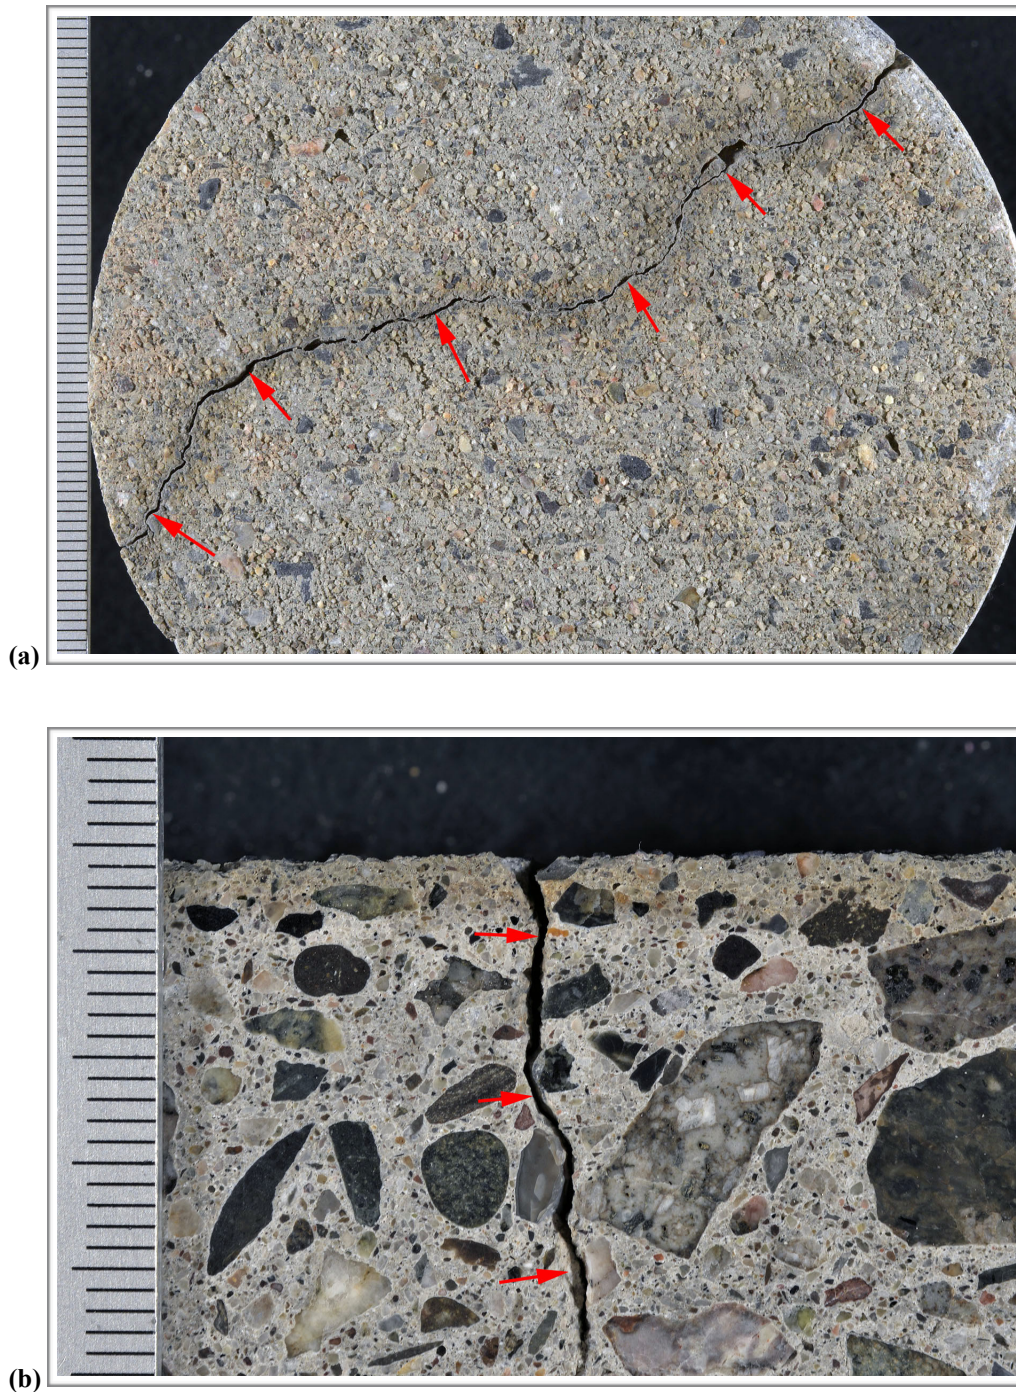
Photograph showing detail of the top surface; scale in millimeters.
